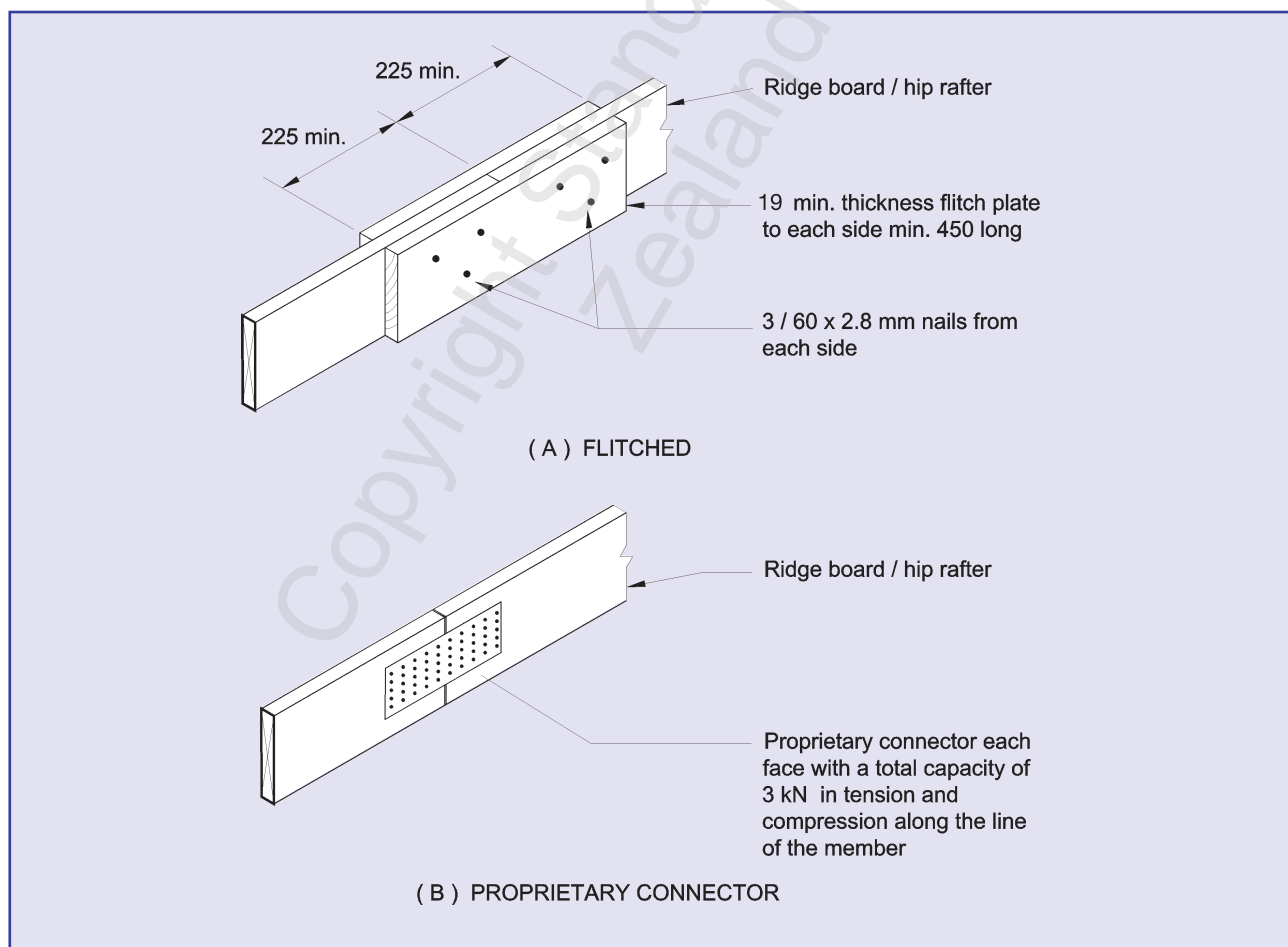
Jointing hip rafters and ridge boards (see 10.2.1.2.3)
